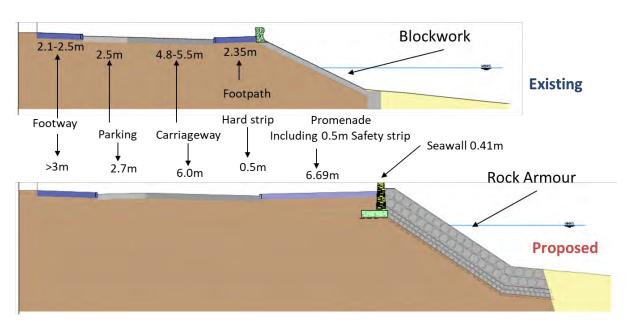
Cross section of proposed Shore Street Widening and Promenade
